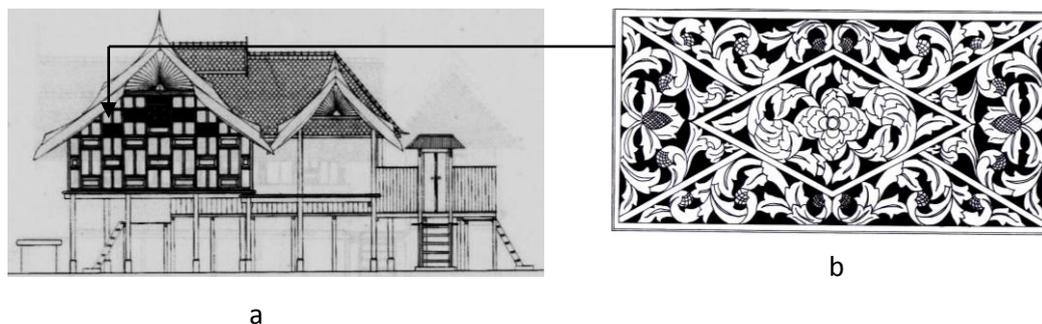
The layout of carved components at wall facade of *rumah ibu* at Mohamad Dobah's house (a) and one of carved ventilation panels (b) found on the wall
